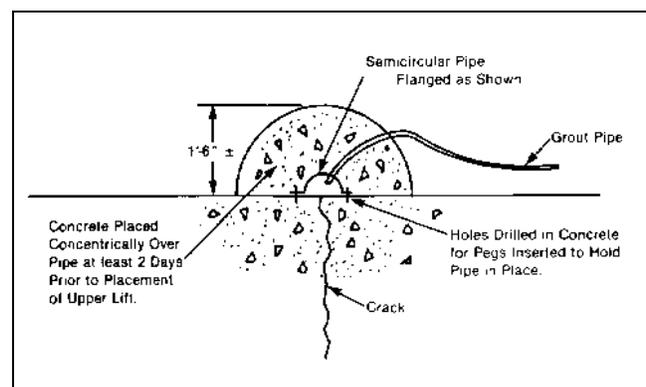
The use of a semicircular pipe in the crack arrest method of concrete repair
